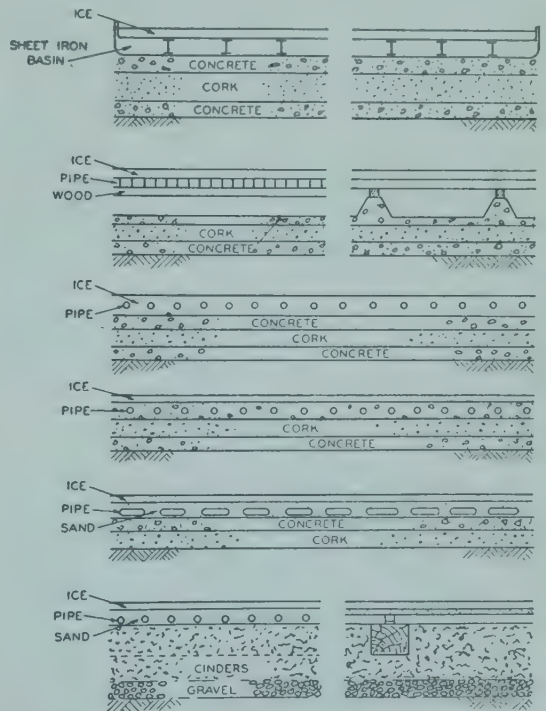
Various Cross Sections of Rink Floors and Foundations.
